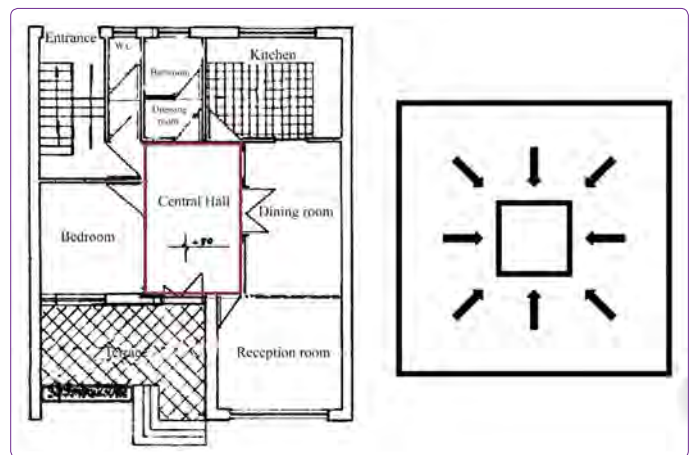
Exemplary central-hall plan layout built during the 1980s (Tabriz Municipality Archive, 2018).
